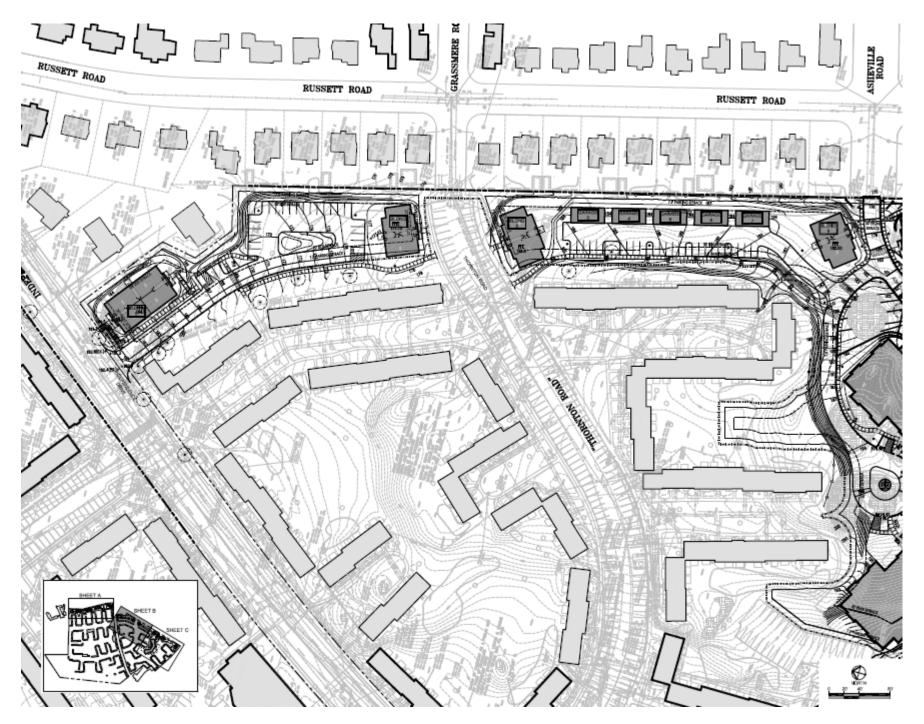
Site Plan Sheet B: Grading Contours, East Parcel
